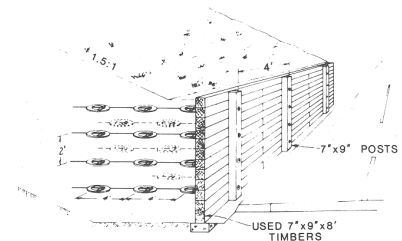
Oblique drawing of the tire-anchored timber wall.
